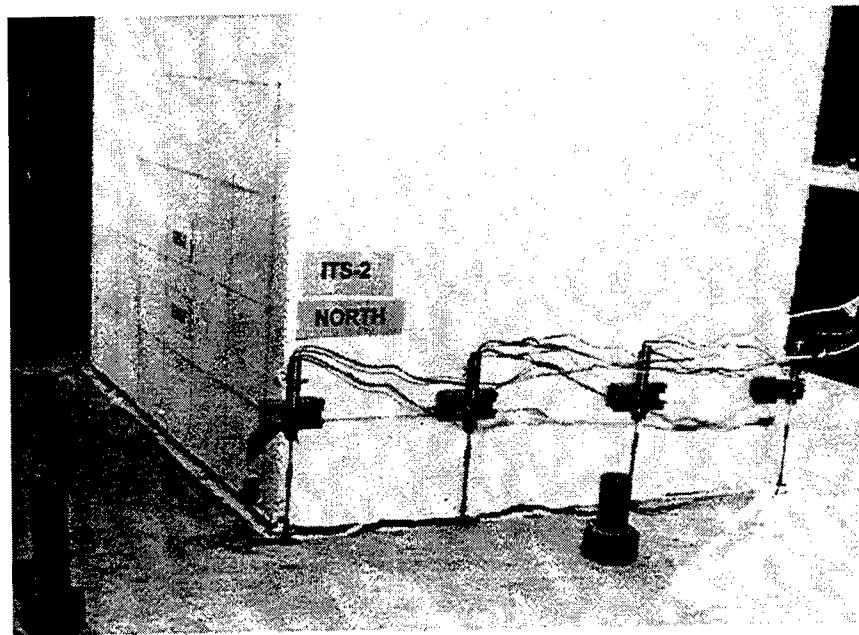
ITS-2 view of north wall, imposed top deflection of 2 in. towards the west.
